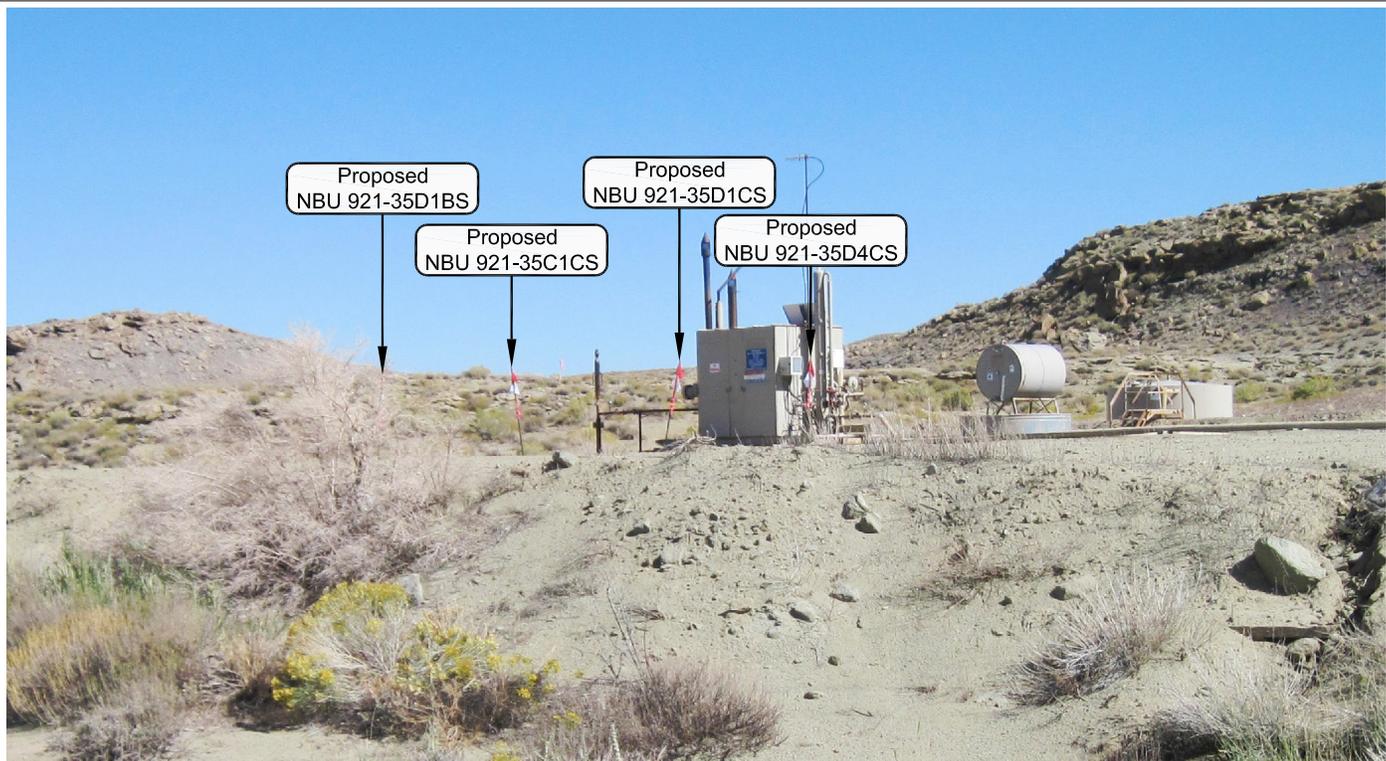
PHOTO VIEW: FROM CORNER #1 TO LOCATION STAKE
